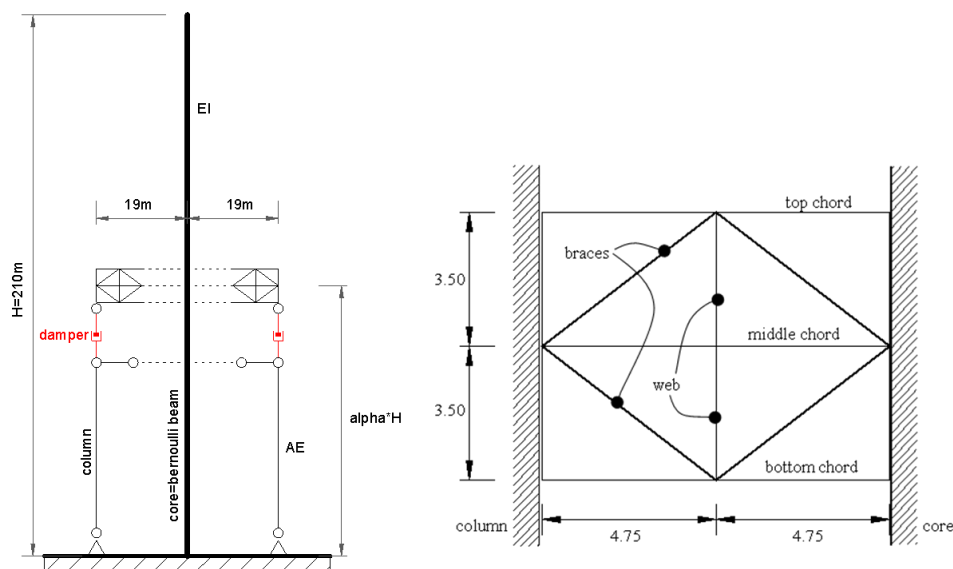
Model of the building with damped outriggers (left) and configuration of the outrigger (right)
